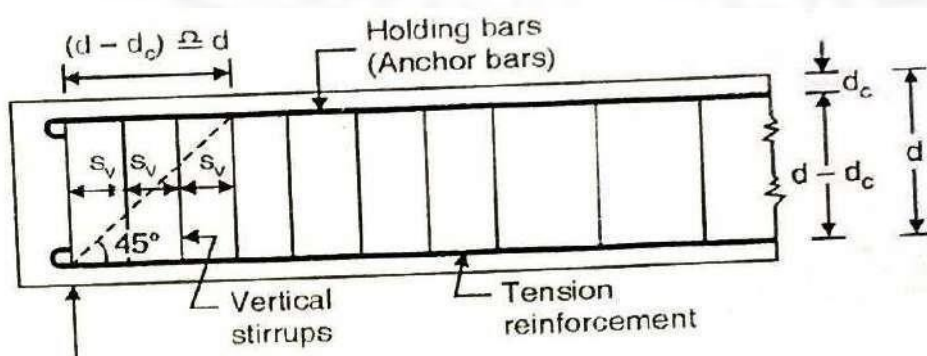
SPACING OF VERTICAL STIRRUPS
